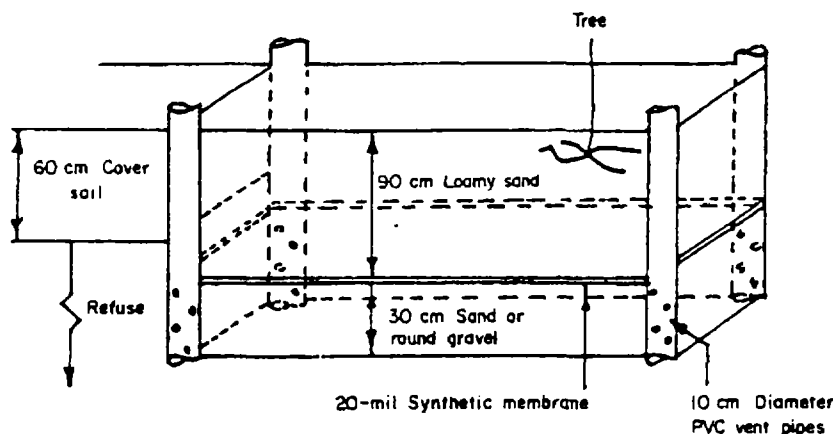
Trench barrier system for small planters. Vent pipes should be spaced no more than 2 m apart.
